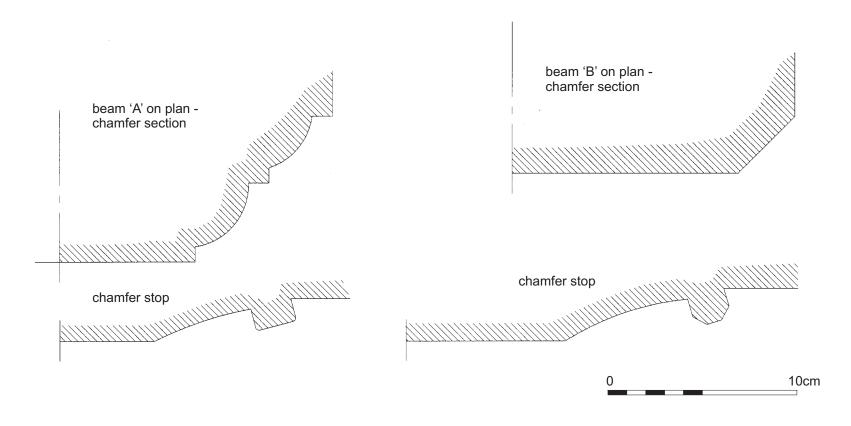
Ground floor ceiling beams, moulding details. Scale 1:2 $\,$
